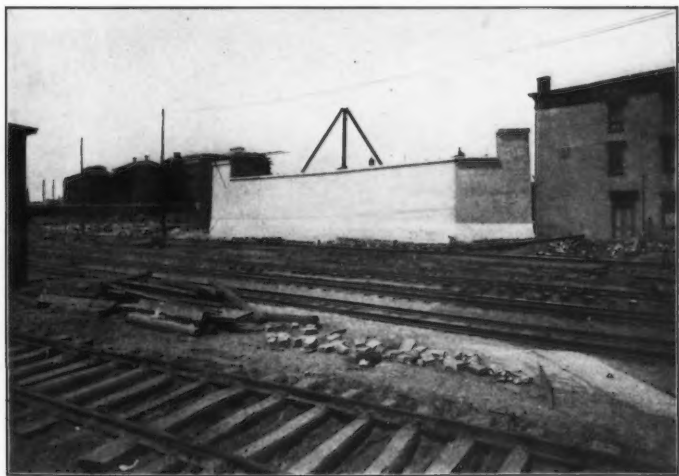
THOMSON AVE. BRIDGE: MASONRY OF NORTH ABUTMENT ABOUT COMPLETED.
